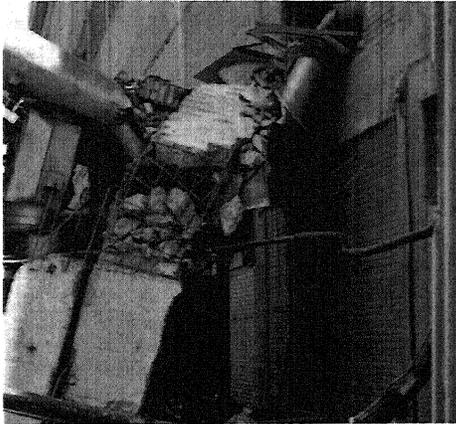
Damage to bus-duct of Lowshan power plant due to non-structural elements.
